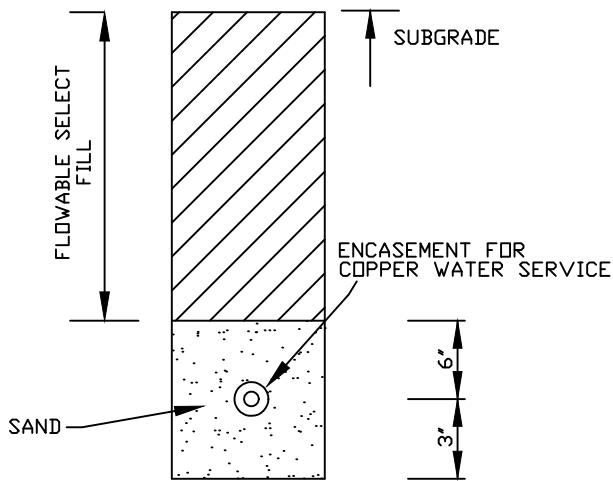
DETAIL - REPLACEMENT OF STREET AND HIGHWAY SURFACES
